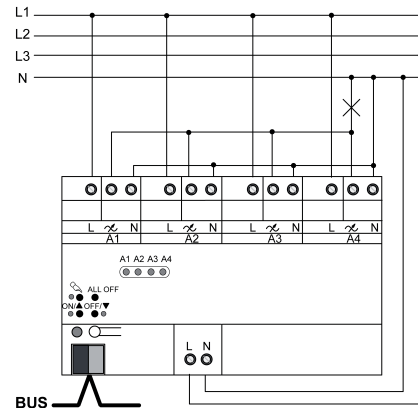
Connection example, parallel switching (only 4-gang dimming actuator)
